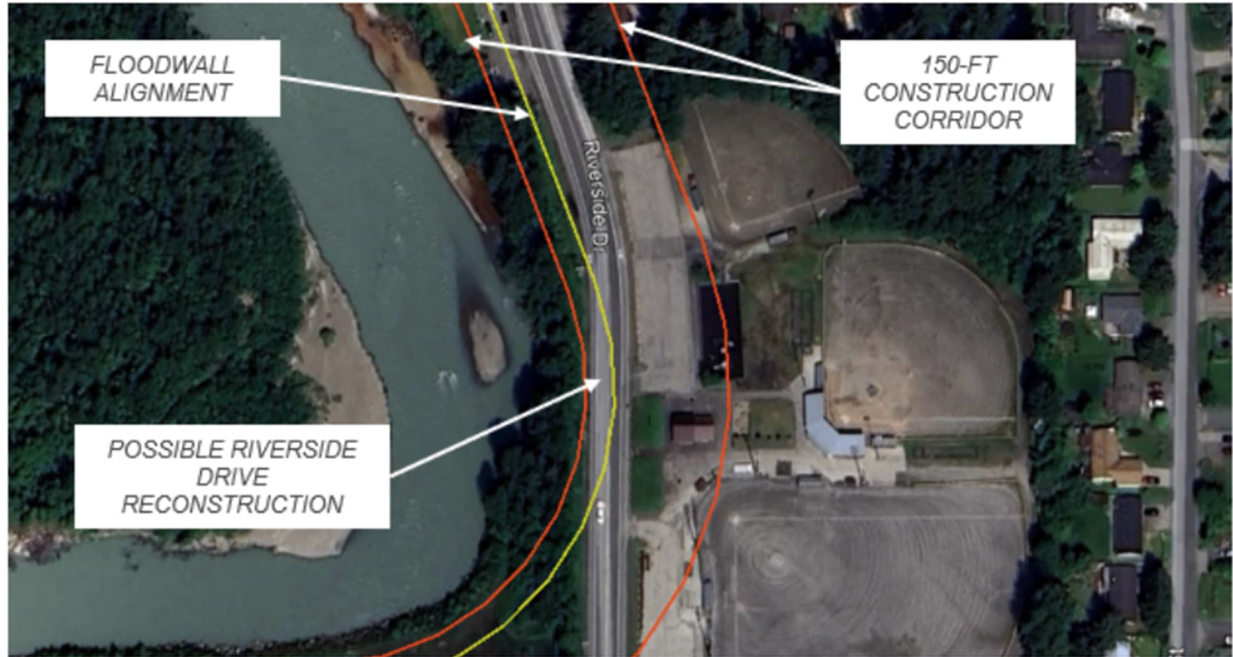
Floodwall Conflict at Riverside Drive and Melvin Park
